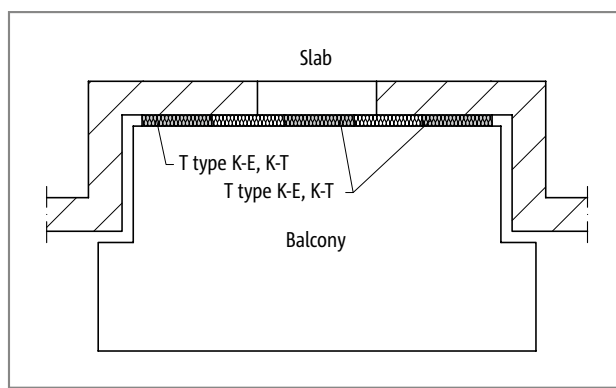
Schöck Isokorb® T type K-E, K-T: Balcony with façade recess
